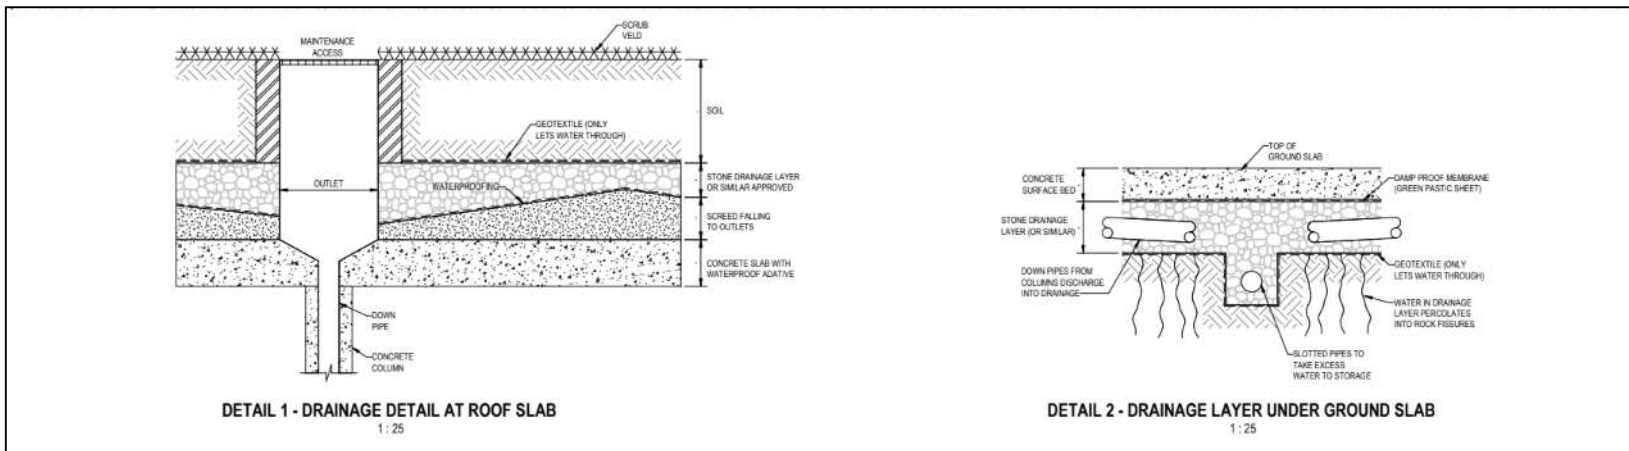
Drainage detail at roof slab on left, Drainage layer detail underneath the ground slab on right
